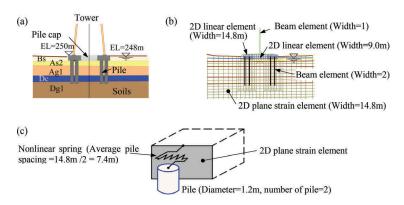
Model of foundation and pile-soil interaction. (typical example of tower No.2): (a) Side view of pile foundation. (b) Finite element mesh. (c) Pile-soil interaction spring.
